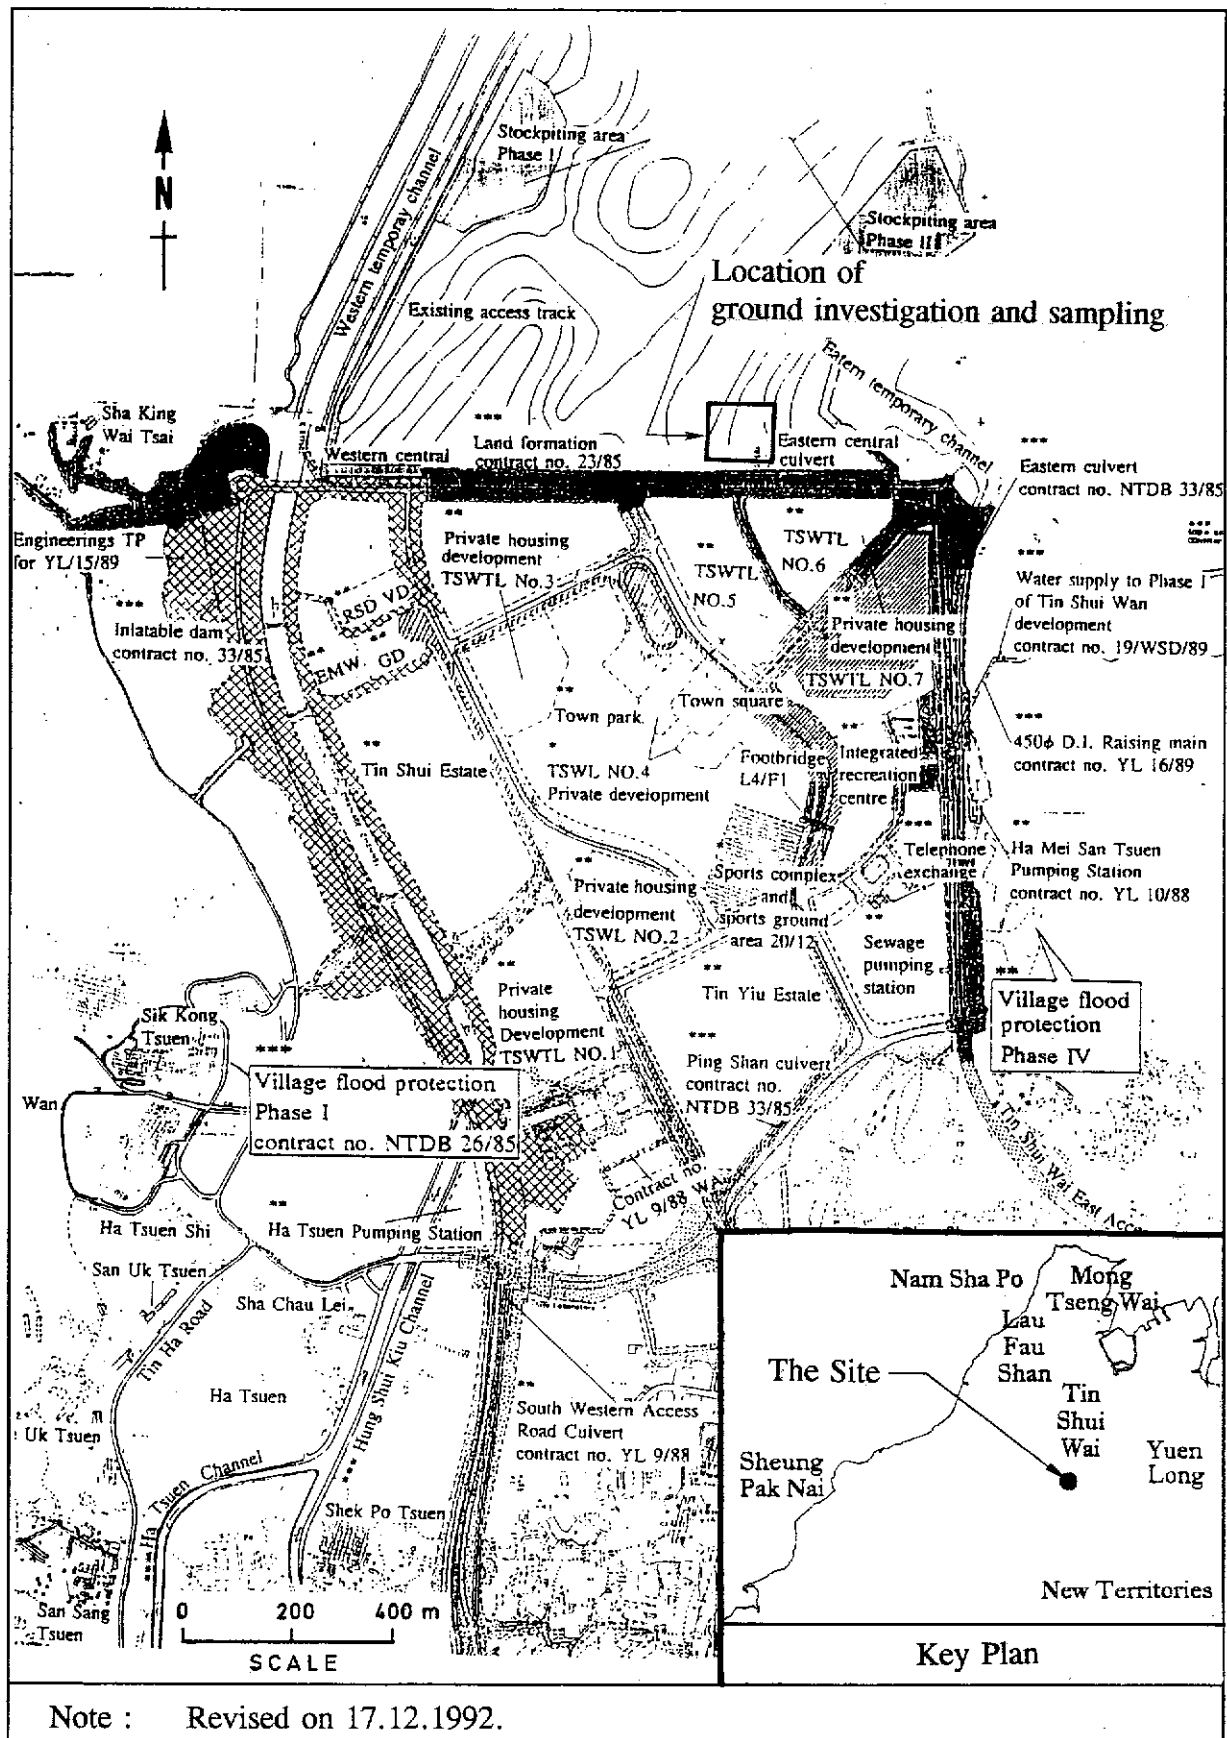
Site Location Plan (Tin Shui Wai Development Reclamation)
